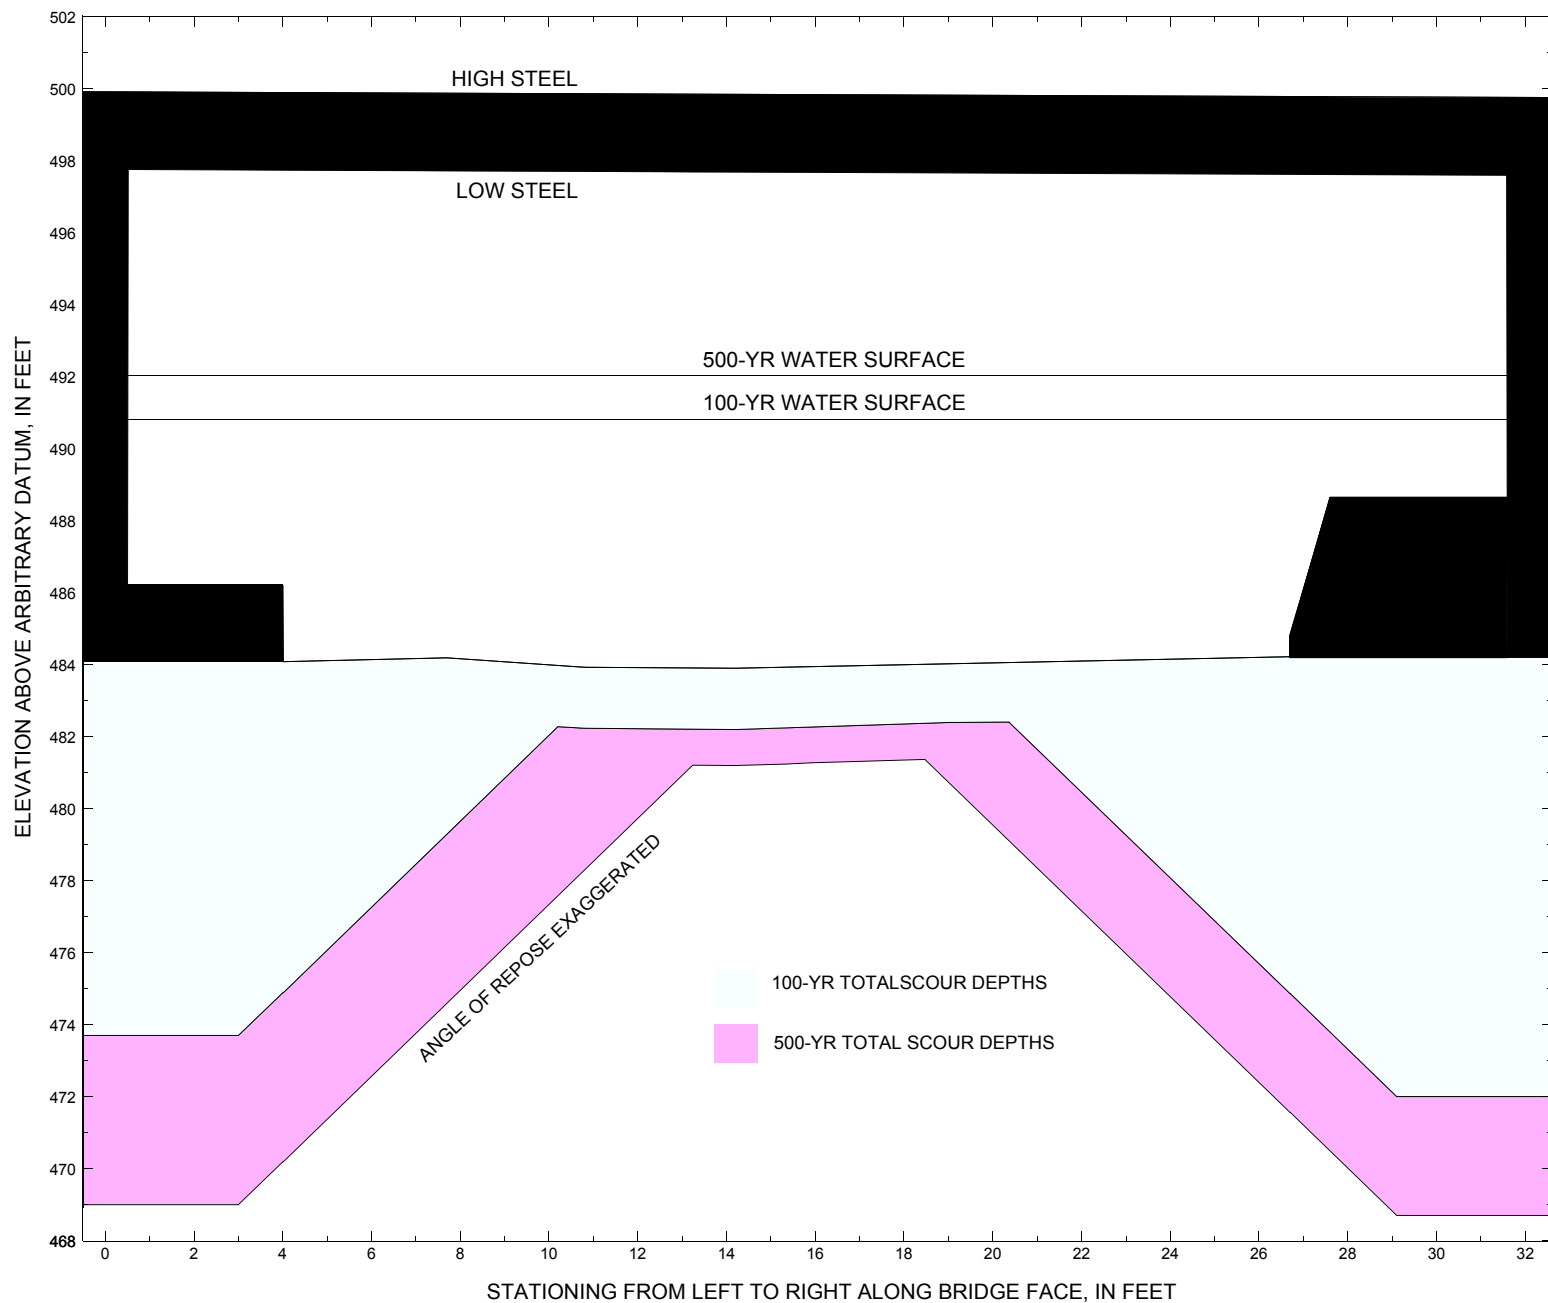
Scour elevations for the 100-yr and 500-yr discharges at structure [BRIDTH00040043](#) on town highway 4, crossing [Dailey Hollow Branch, Bridgewater, Vermont](#).
